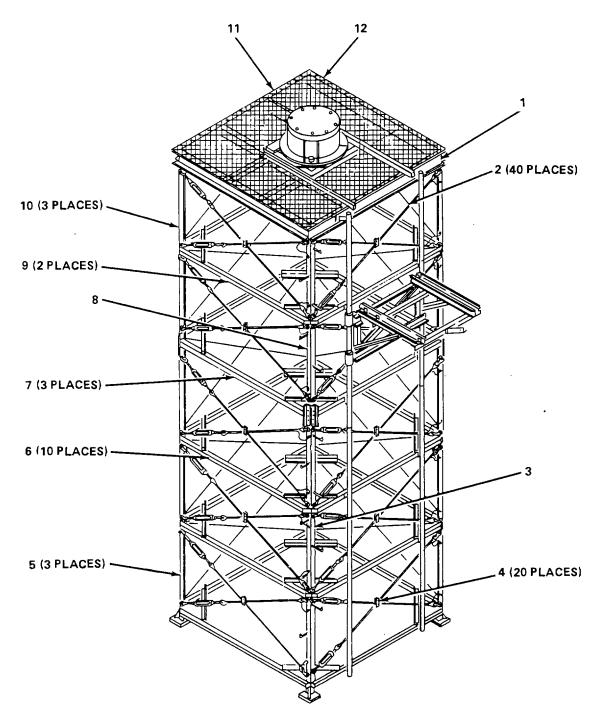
Tower Assembly Kit (Sheet 1 of 6)
